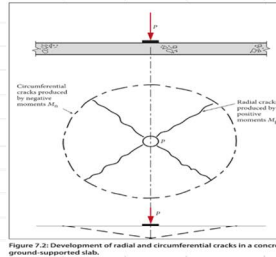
Development of radial and circumferential cracks in a concrete ground-supported slab.
